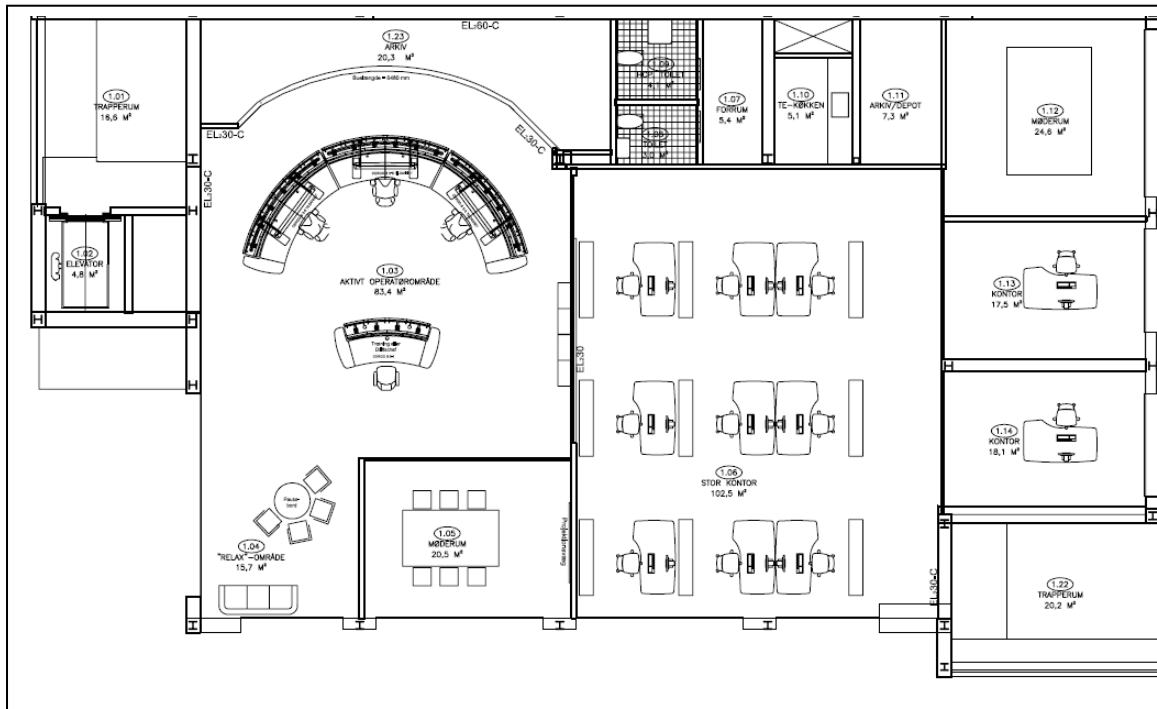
Lay-out of the Vattenfall Wind Power "24/7 surveillance centre" floor in the new O&M building in Esbjerg, Denmark.
